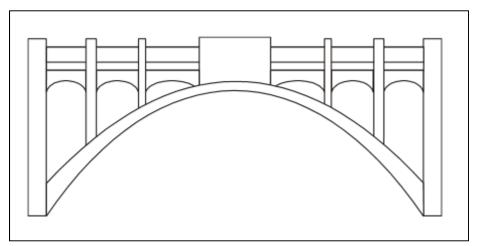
AN OPEN SPANDREL RIB CONCRETE ARCH (MILLER ET AL. 2000:11)
